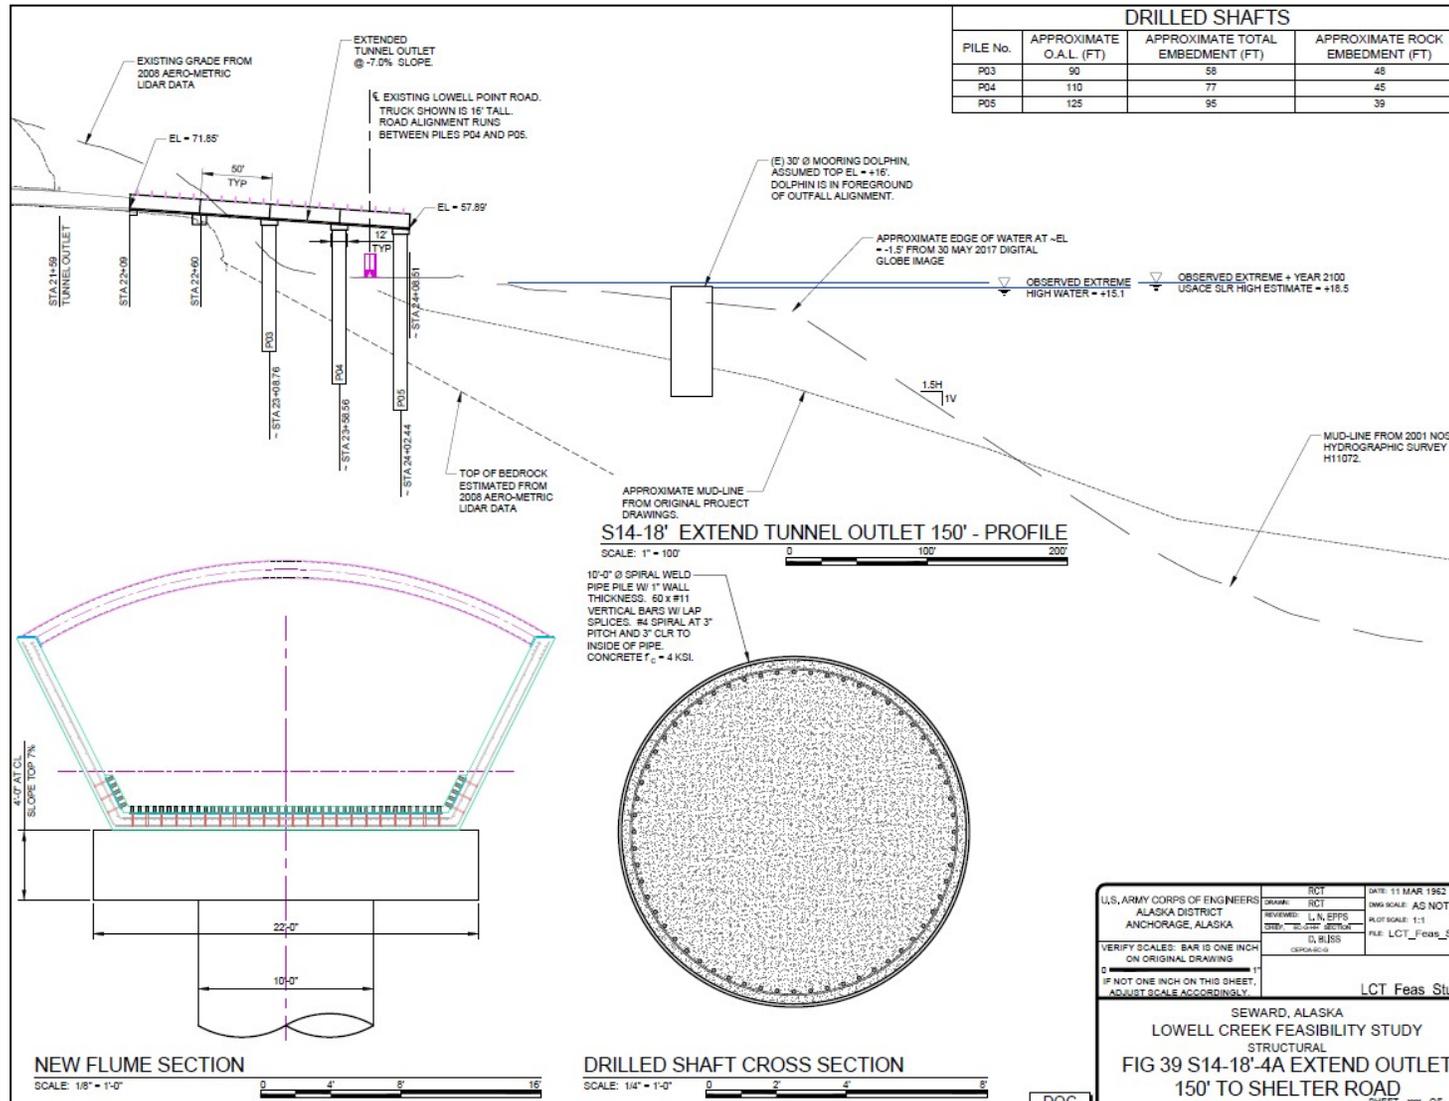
Extend Alternative 4A and 4B Tunnel Outlet 105' to Shelter Road (Alternative 4A shown, Alternative 4B similar)
